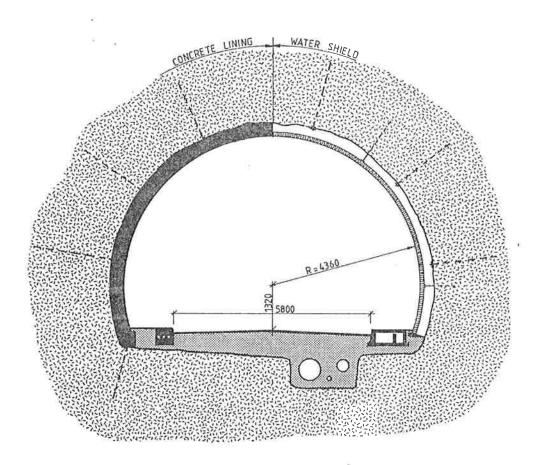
Cross sections of tunnel showing rock support in poor rock on the left side and water shields on the right side.
